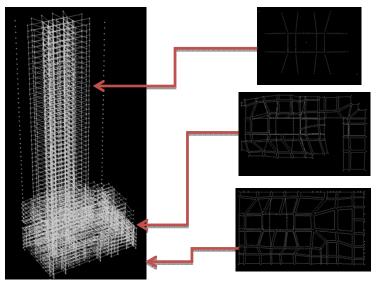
Typical tall building elevation and plans modeled in Perform 3D (Powell, 2007).
